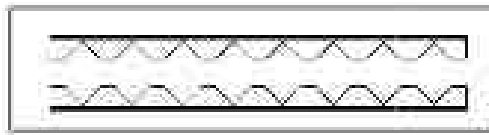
After removal of waste parts beam is ready for stitching (source: drawing from AutoCAD)
